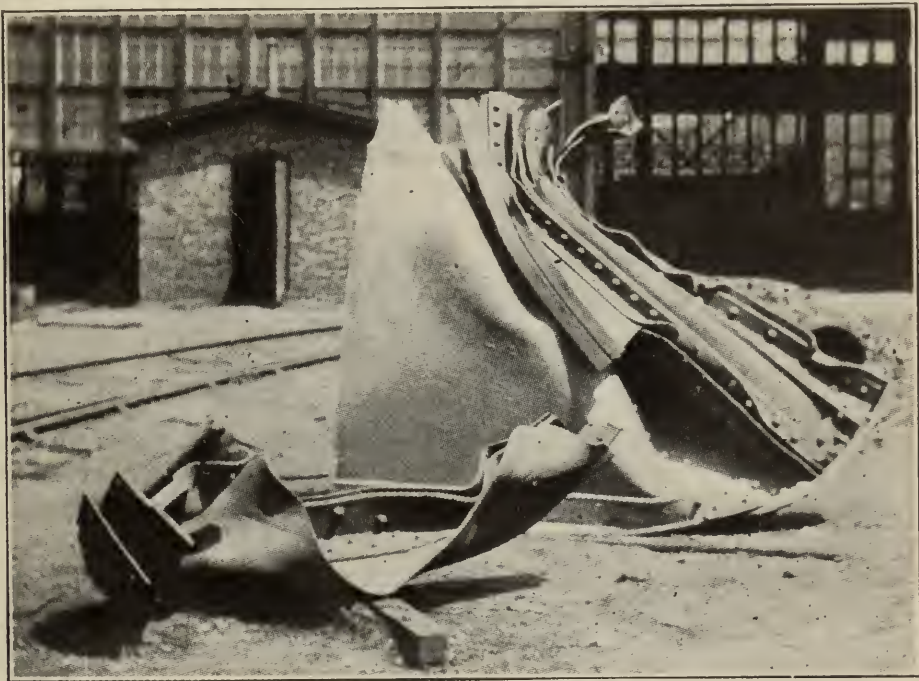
Plate Girder, Folded—Rivets Sheared Off, but Web Not Fractured.
